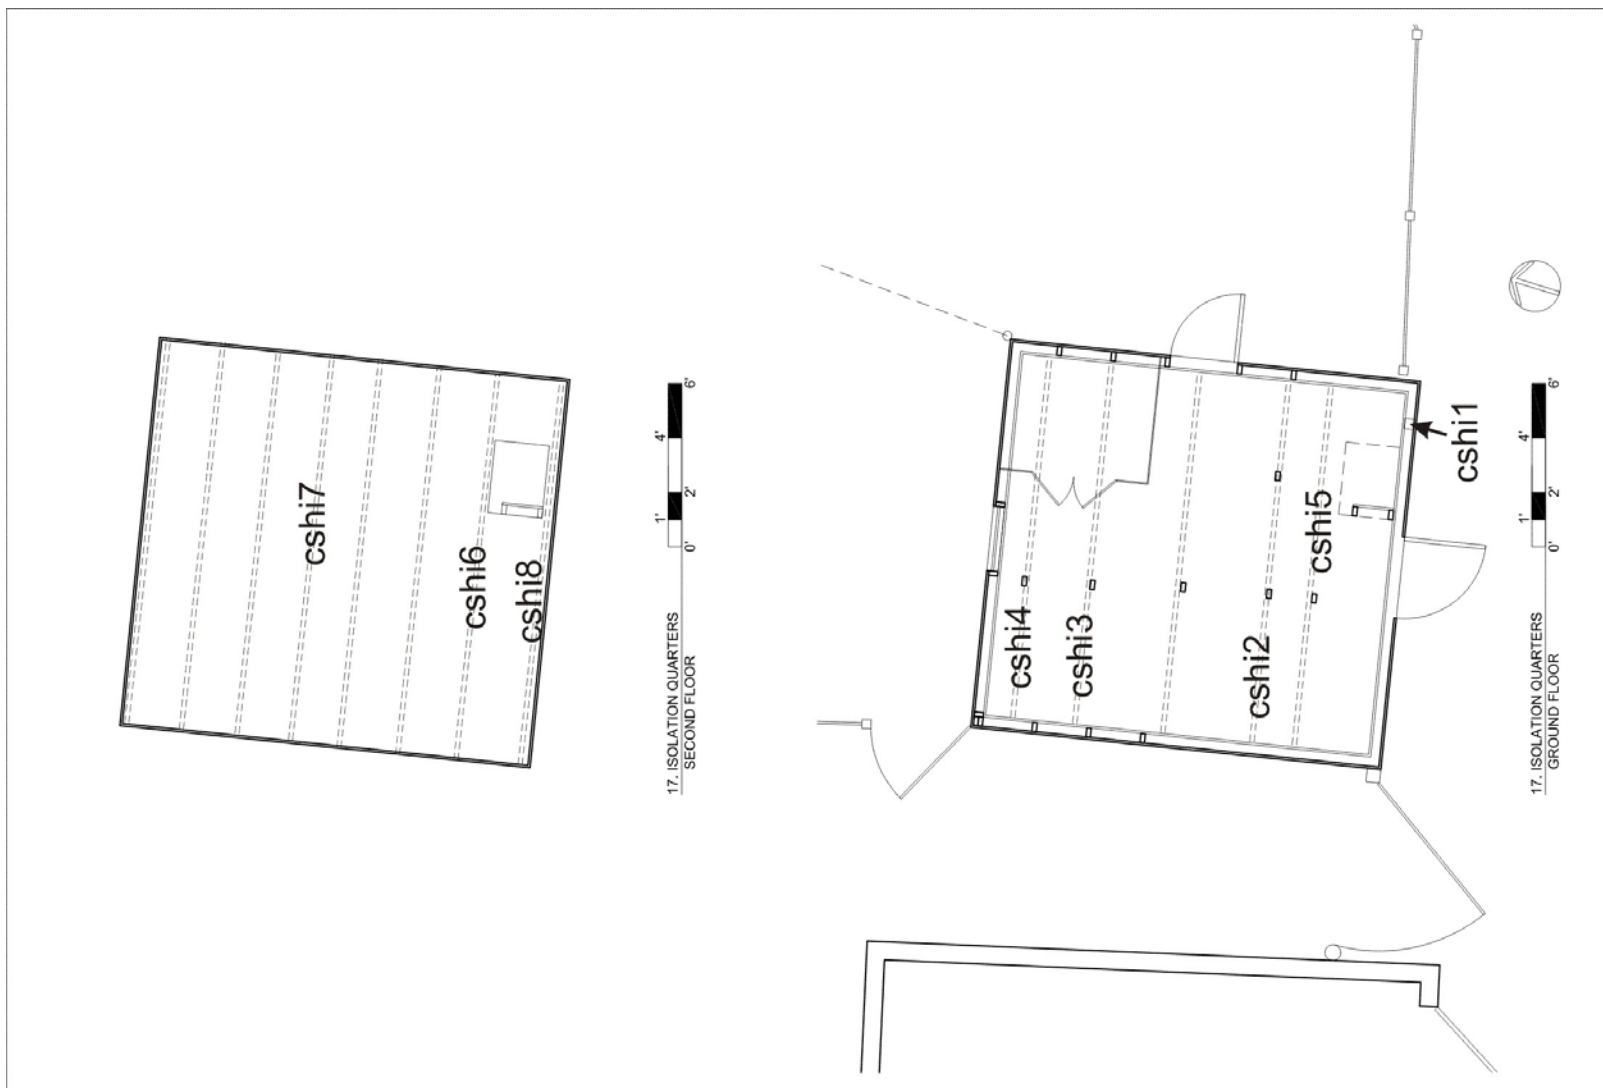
Drawing showing location of samples taken from the Isolation Quarters attic (left) and first floor (right) at the Carl Sandburg Home (after Joseph K. Oppermann - Architect 2011)
